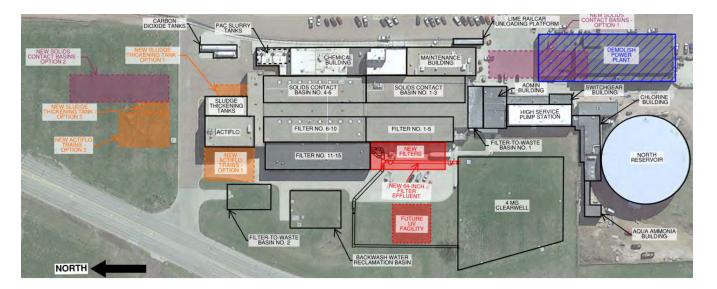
SFWPP SITE PLAN WITH ALL RECOMMENDED IMPROVEMENTS IMPLEMENTED
